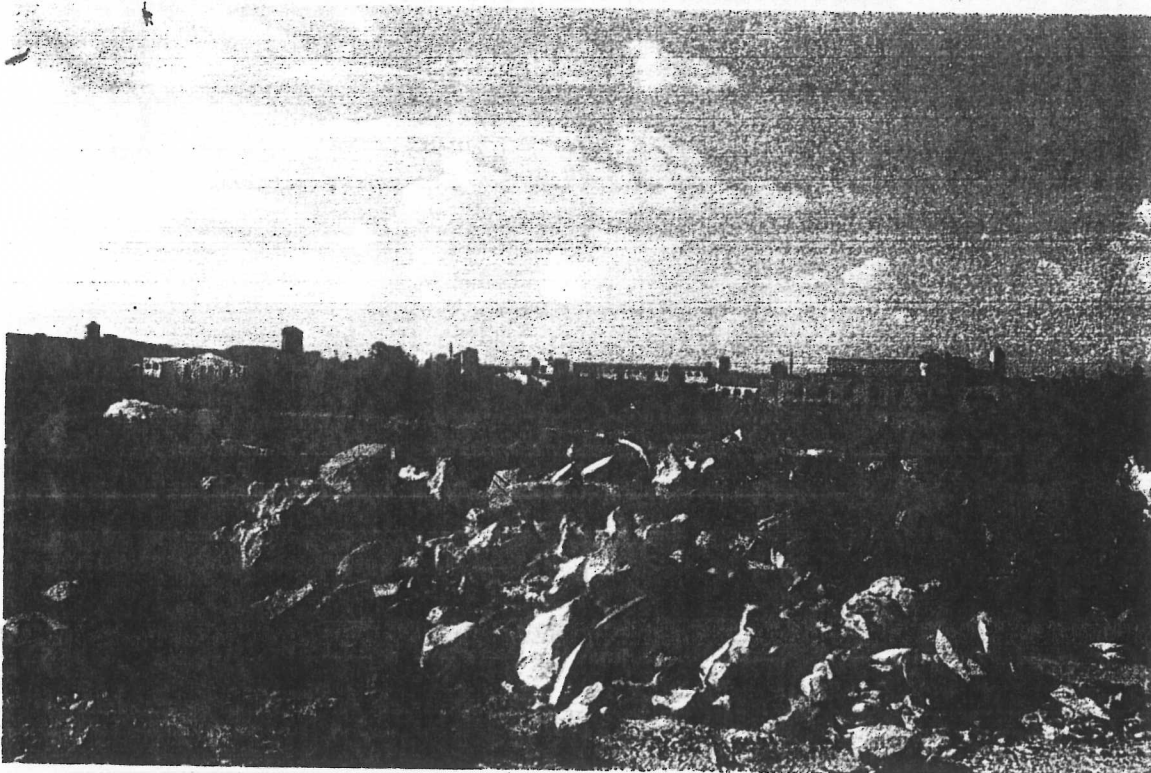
Construction rubble at the proposed site. Pig farms can be seen in the background.
